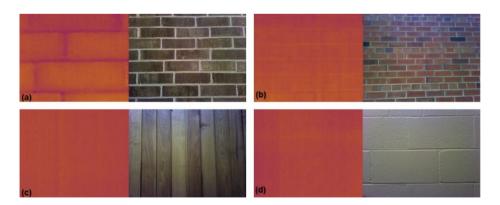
Examples of thermal and digital images captured from different building surfaces, (a) exterior brick wall, (b) brick wall, (c) interior wooden wall, and (d) interior concrete masonry wall.
